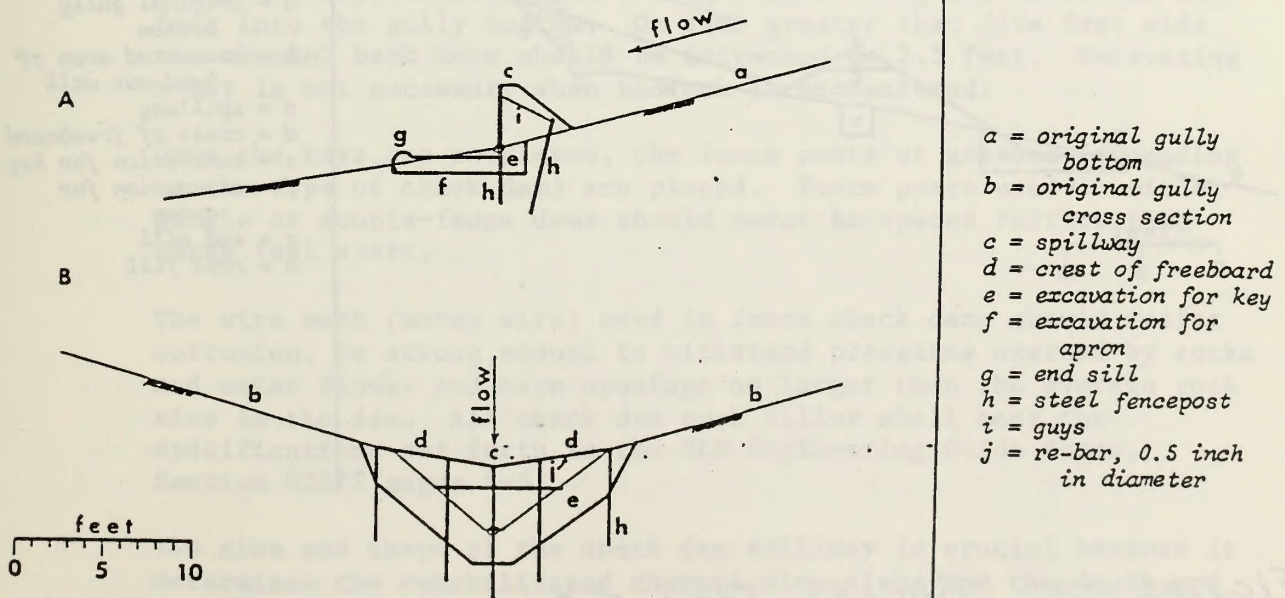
B.\* TYPICAL CONSTRUCTION PLANS FOR A SINGLE-FENCE ROCK CHECK DAM
